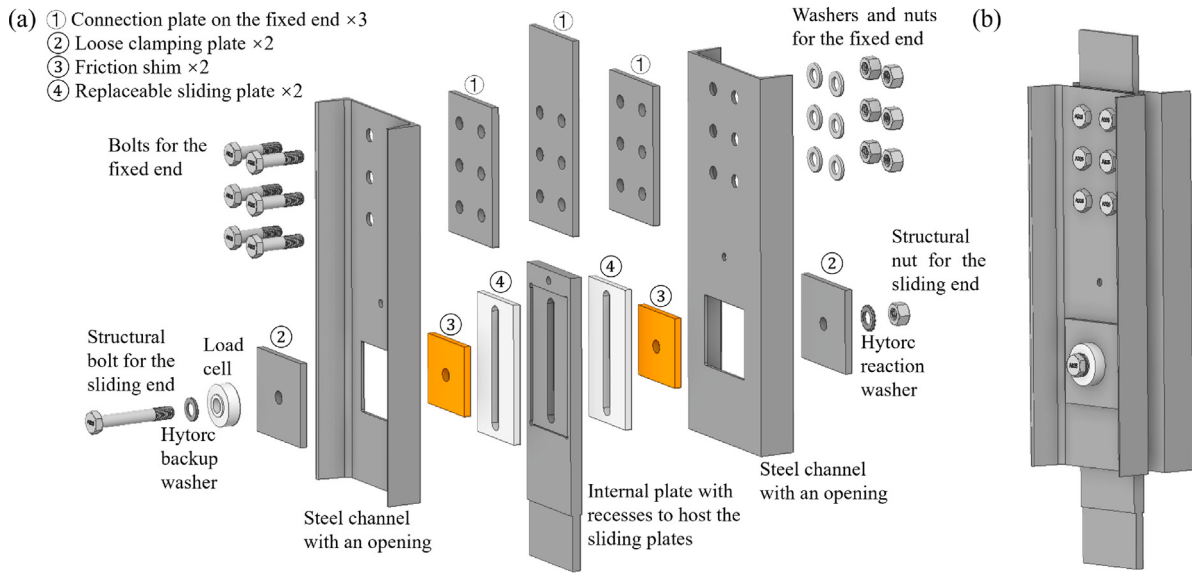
Schematic representation of the friction test setup: (a) Exploded view (b) Assembly.
